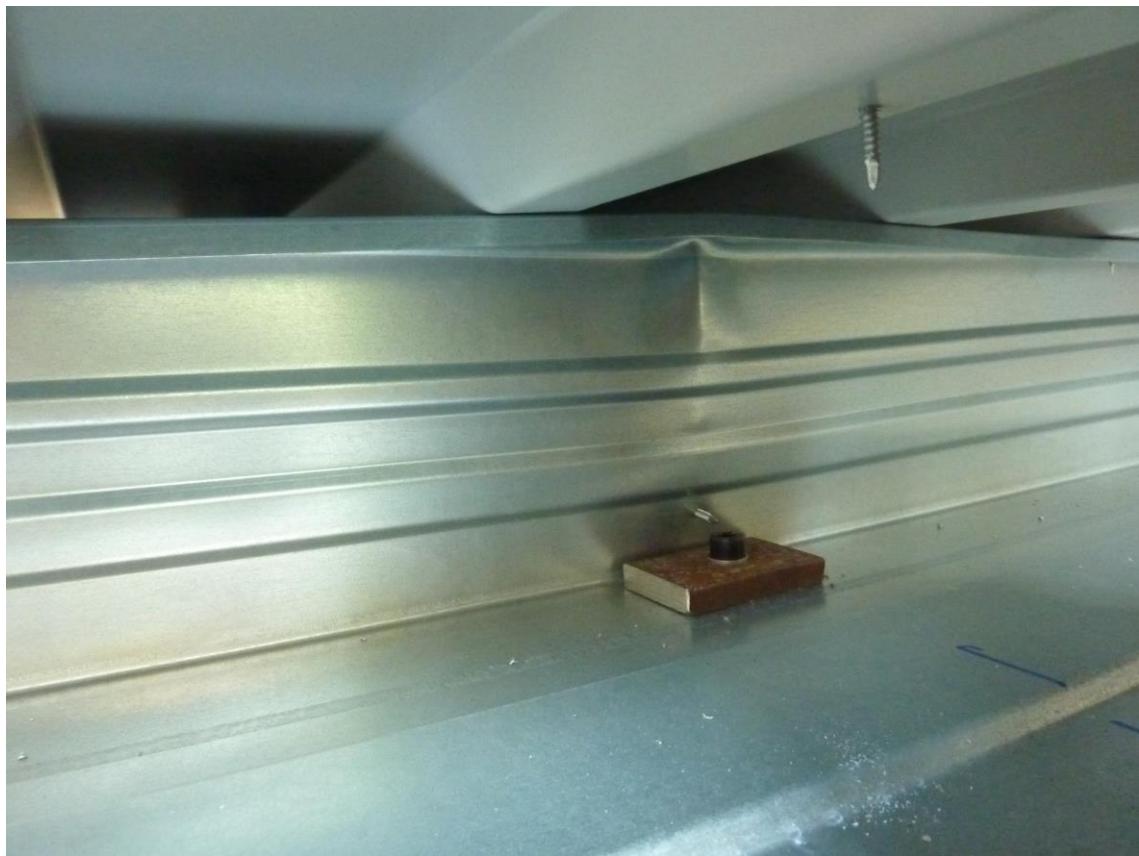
Failure mode (buckling of the upper flange)
